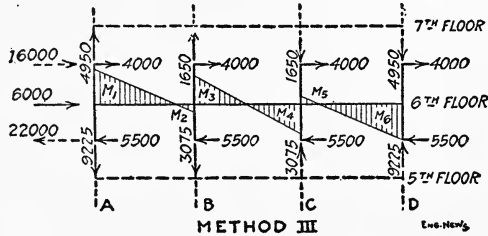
COLUMN-SHEARS AND GIRDER MOMENTS AT SIXTH FLOOR, CALCULATED BY METHOD III
